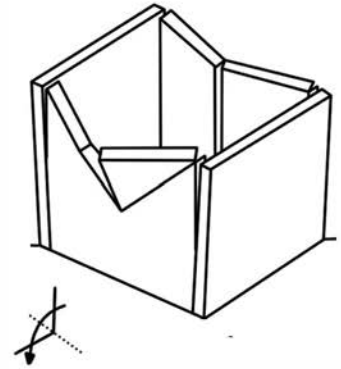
Horizontal arch mechanism involved upper part of a three floors rural building, Sommati village
